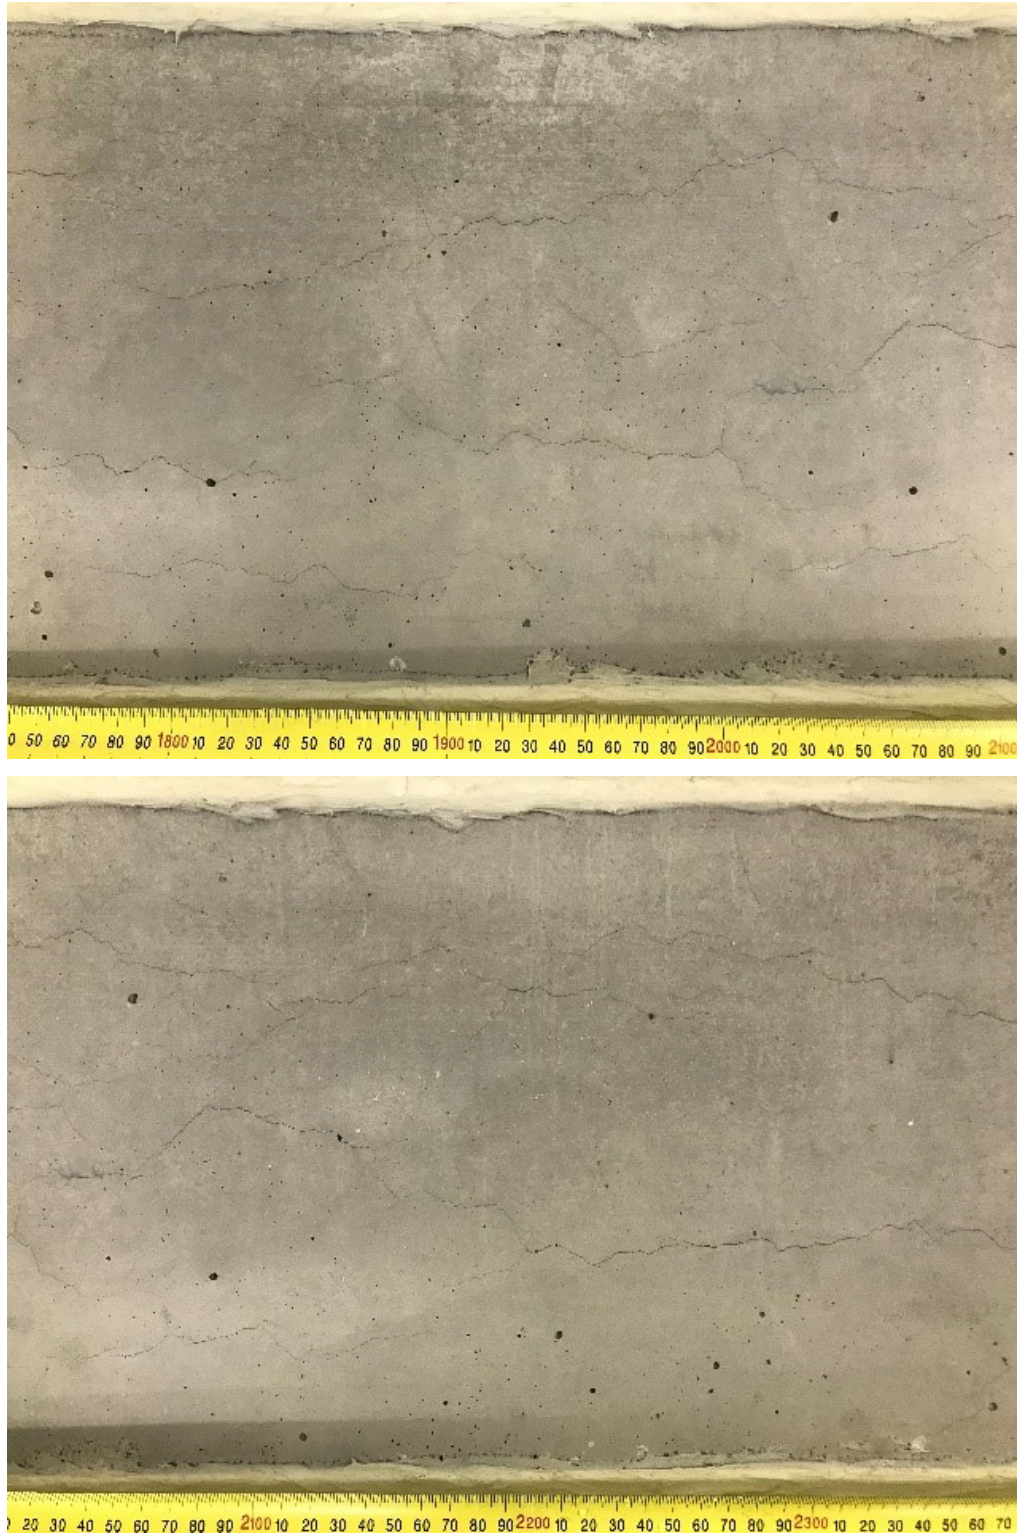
36 Longitudinal cracking on R3 beam surface
